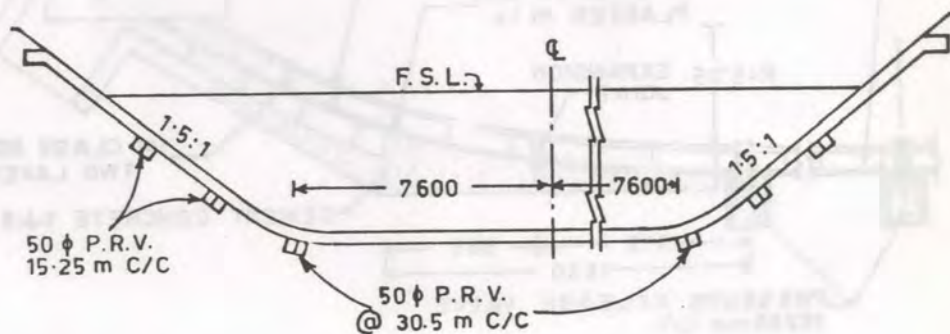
DETAILS OF BRICK TILE LINING ON GANDAK CANAL.
